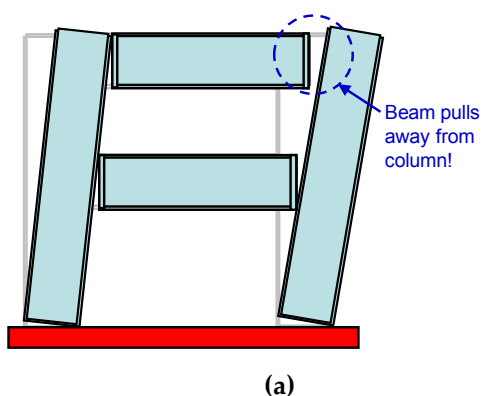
(a) Gap Opening Effect on 2 Storey Frame with Stiff Columns (MacRae, 2010).
